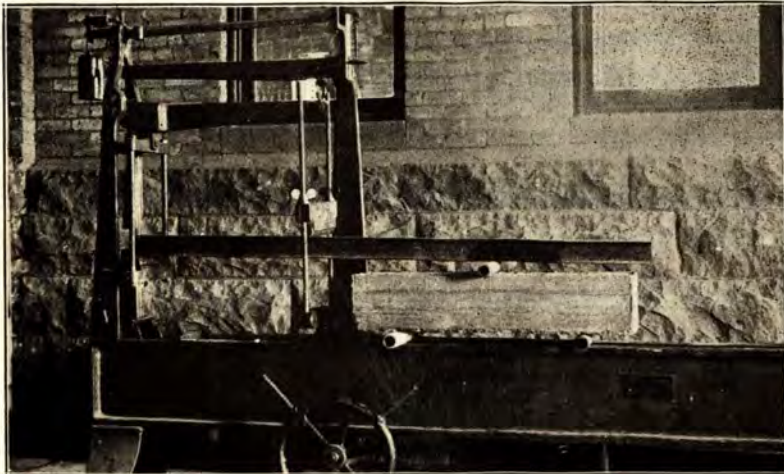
TESTING RAMMED EARTH BEAMS USED IN THE REINFORCING STUDY.
